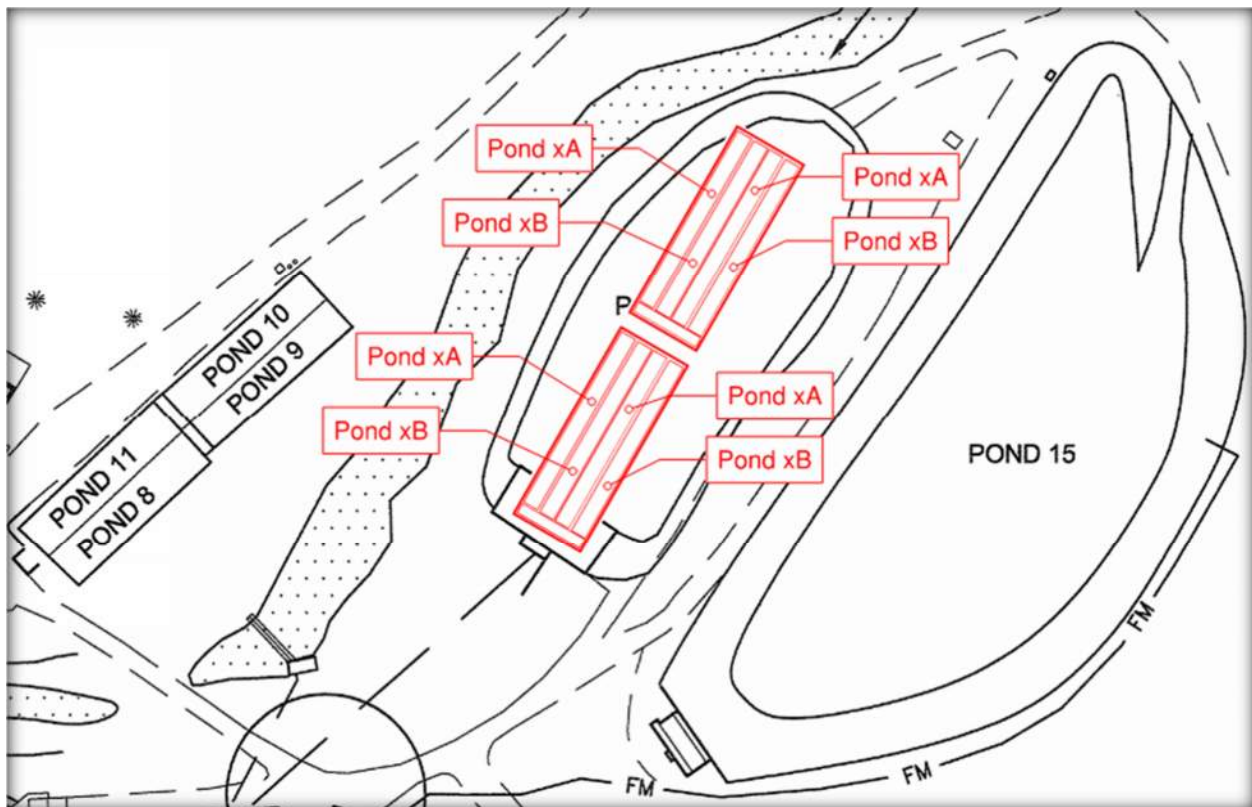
Cedar Creek – Proposed Raceway Layout (Pond 14)
